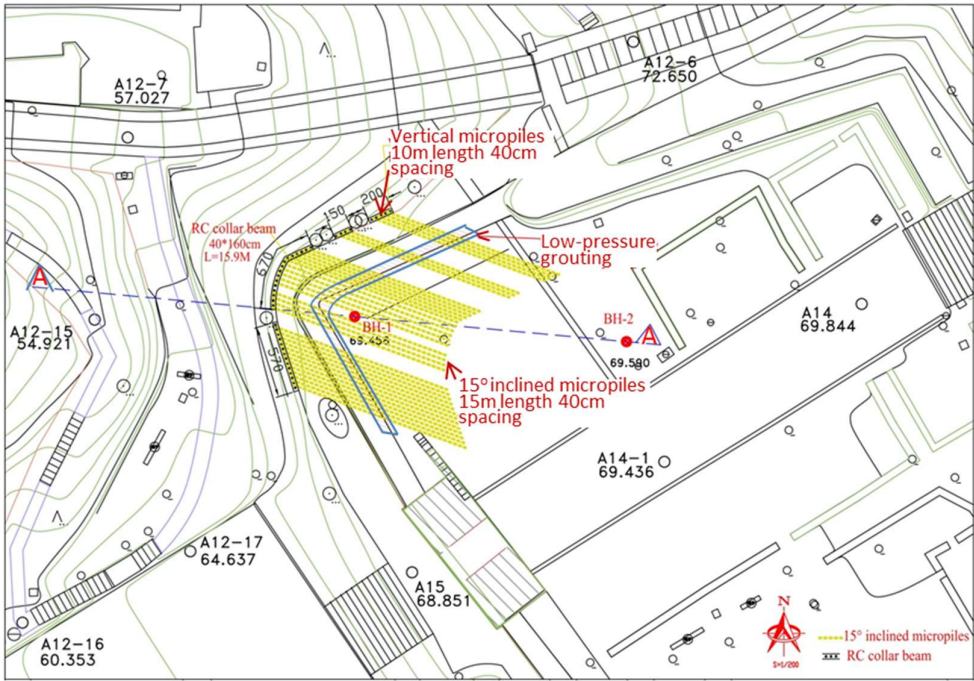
Plane diagram of the micropile configuration scenario for the underpinning strengthening and reinforcement of castle walls
